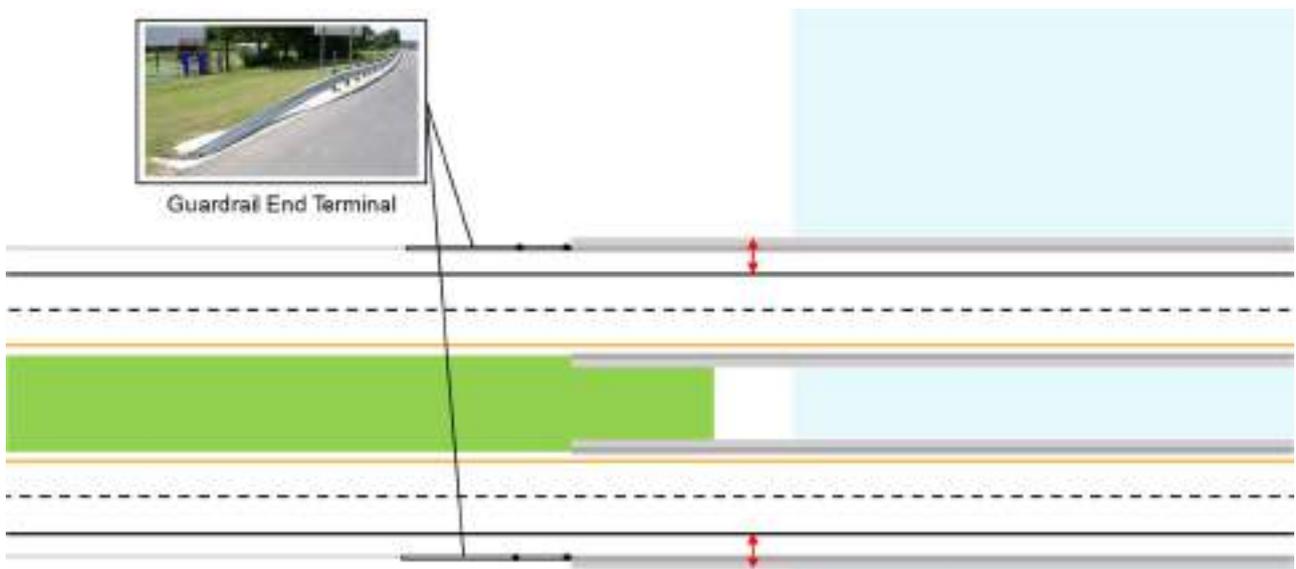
Road width expansion and countermeasures of Guardrail End Terminal
